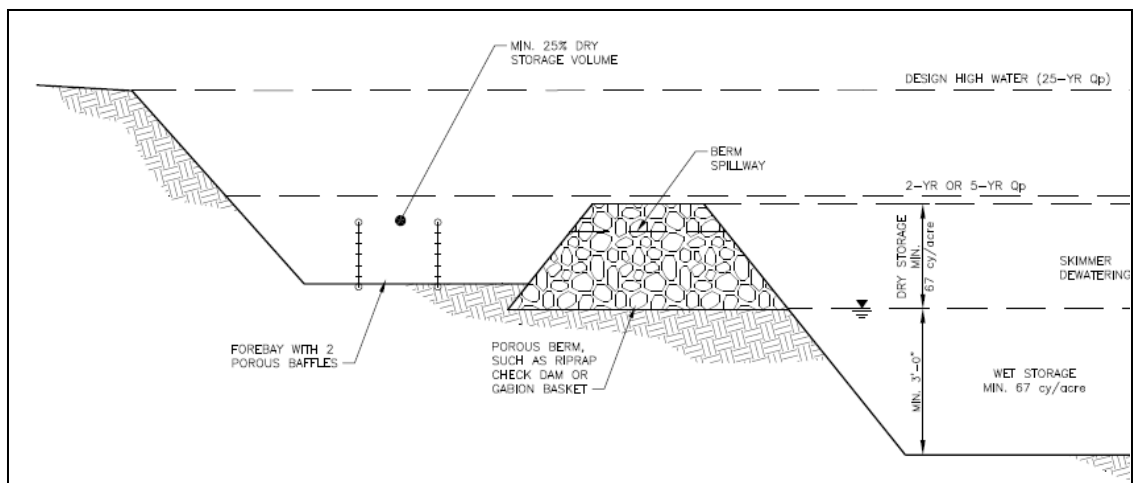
B Cross Sectional View of Forebay, Showing Elevations
